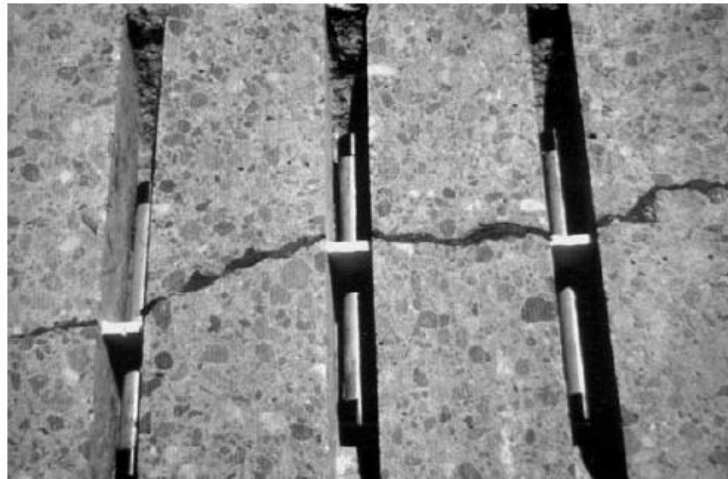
Photo showing dowel retrofit assemblies, including joint re-formers and expansion caps, ready to be cast in place.
